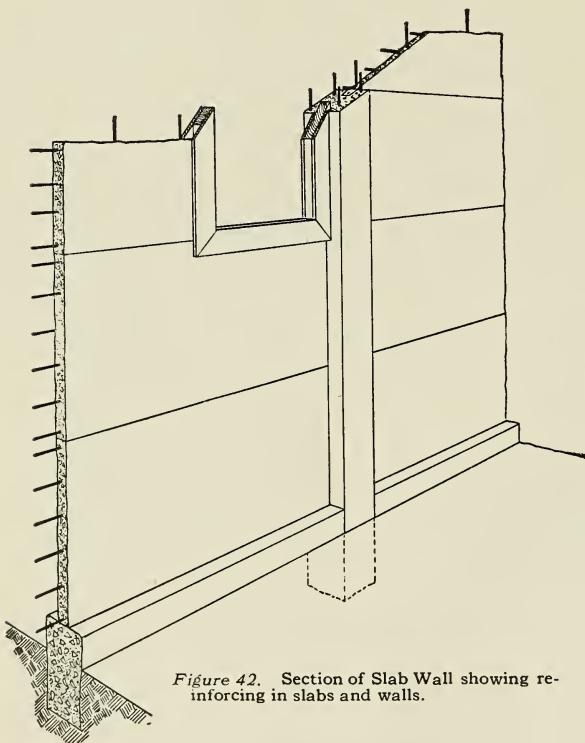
Section of Slab Wall showing reinforcing in slabs and walls.
